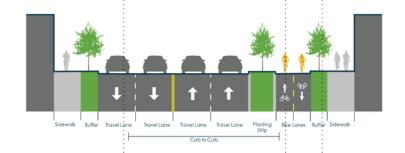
Example Street Cross Section to illustrate implementation of bicycle facilities with roadway widening.
